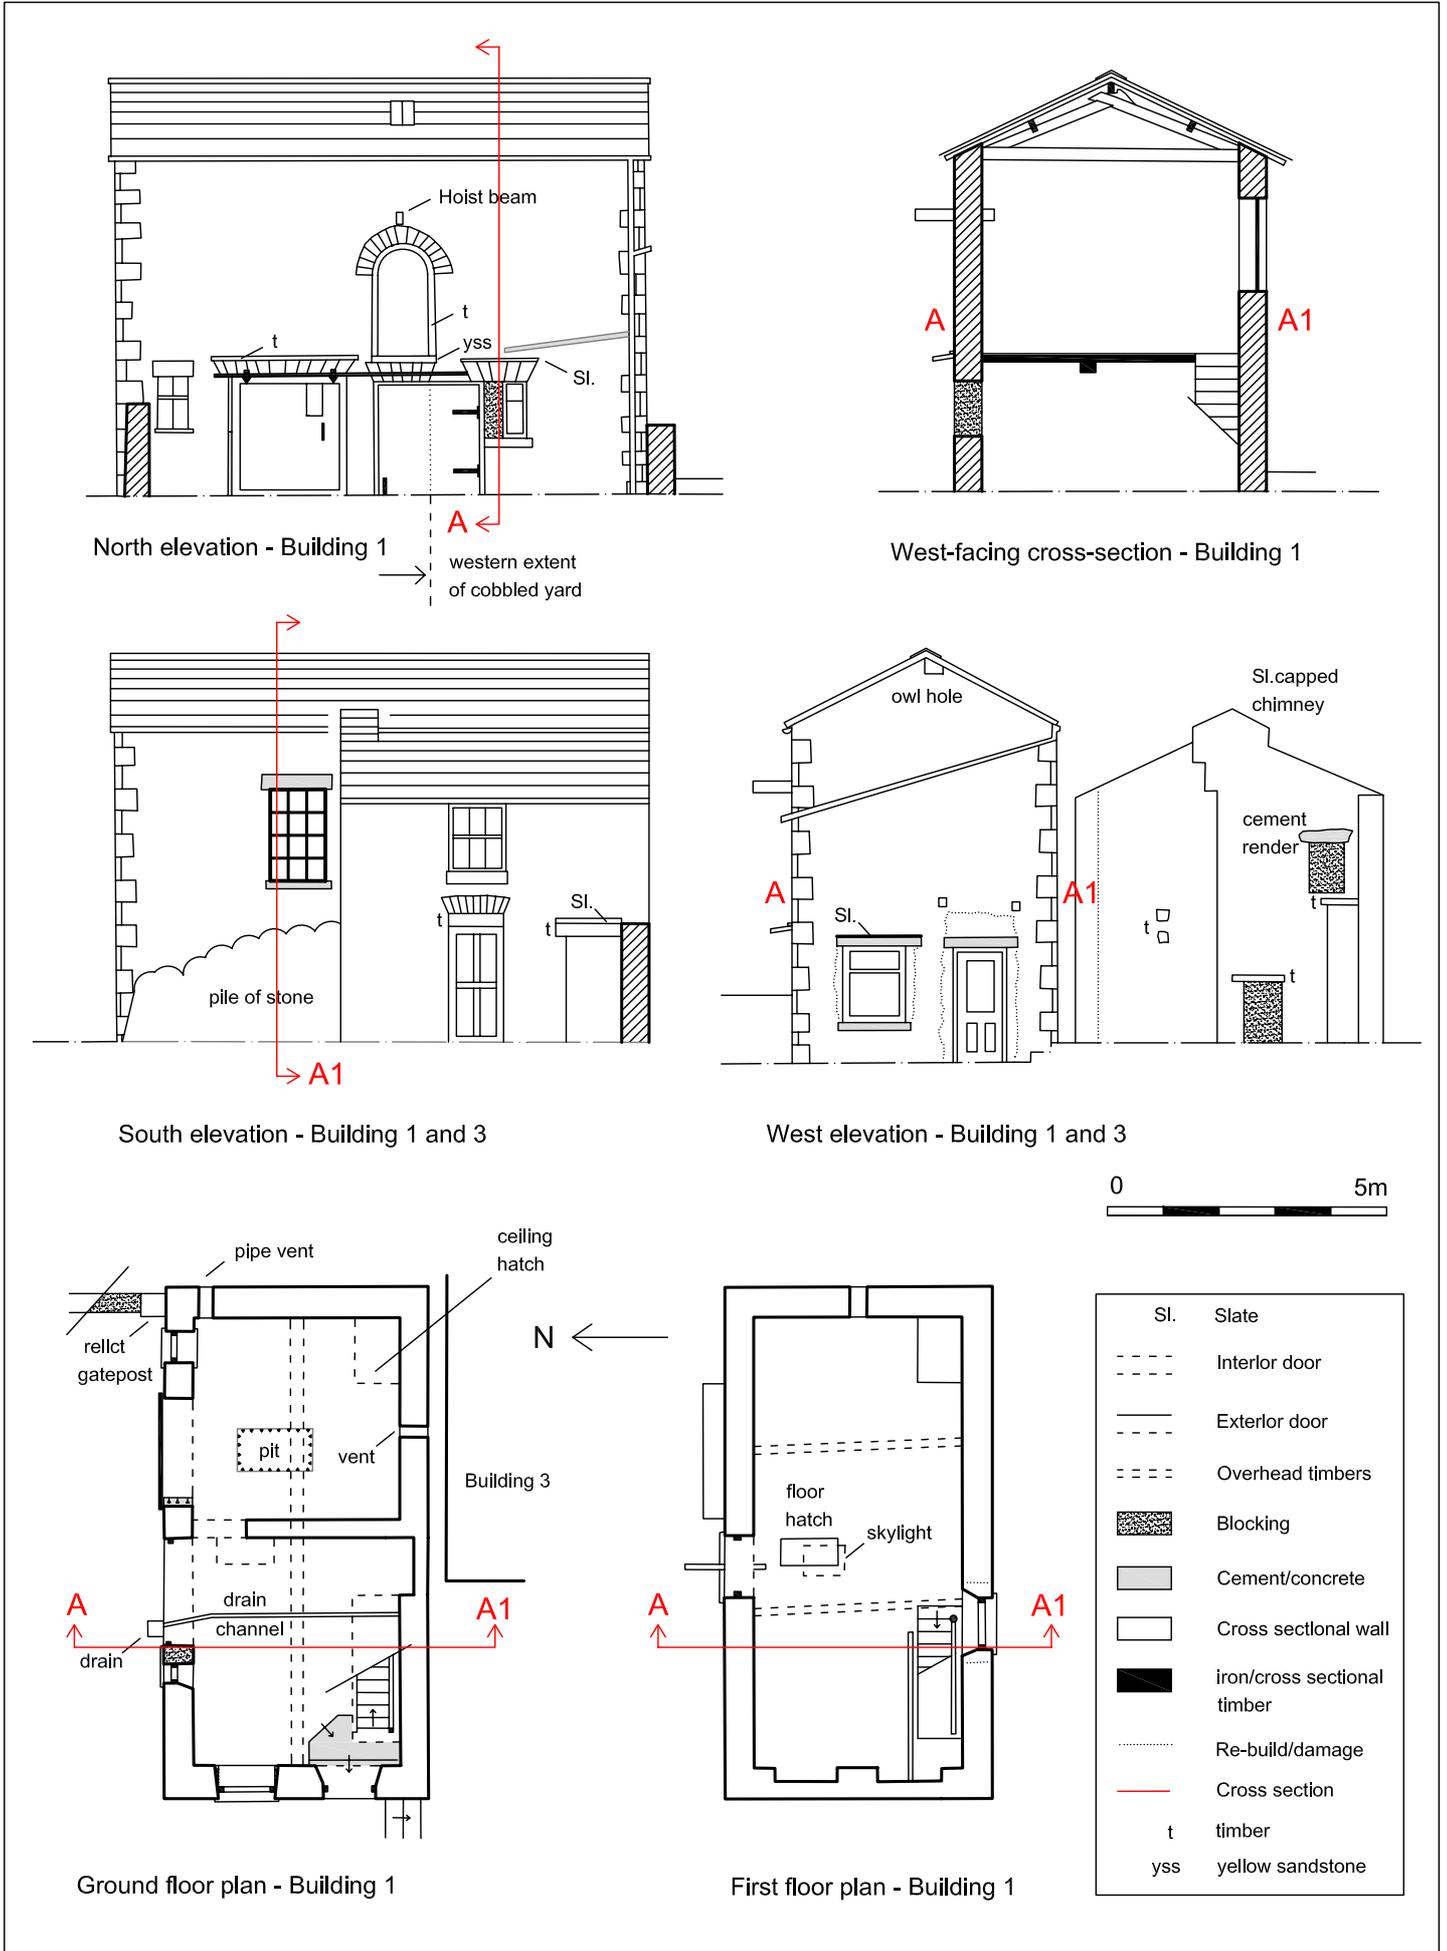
Elevations of Buildings 1 and 3, plans and cross-section of Building 1
